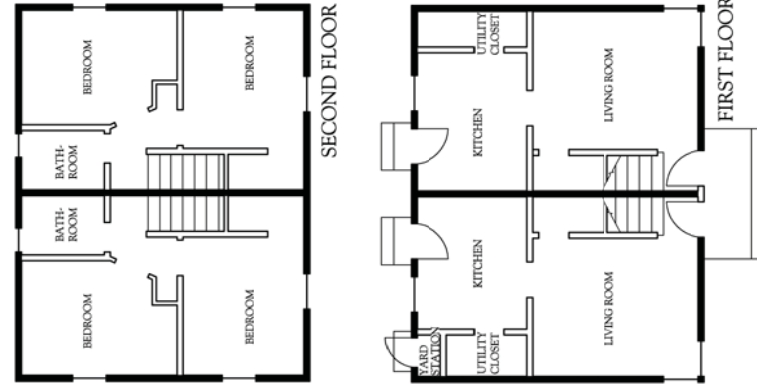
Floor plan of Residential Unit Type 5 (not to scale).
